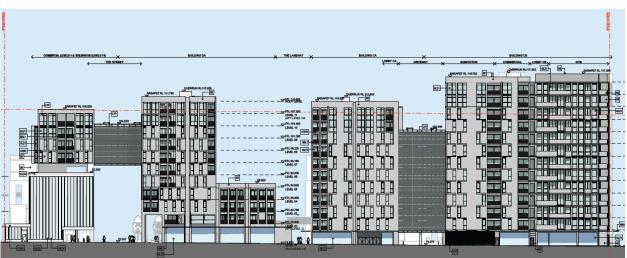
PROPOSED RUTLEDGE STREET ELEVATION
